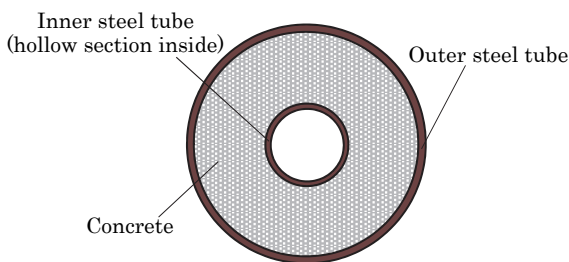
Cross-Section of column with concrete-filled double-skin steel tubes
